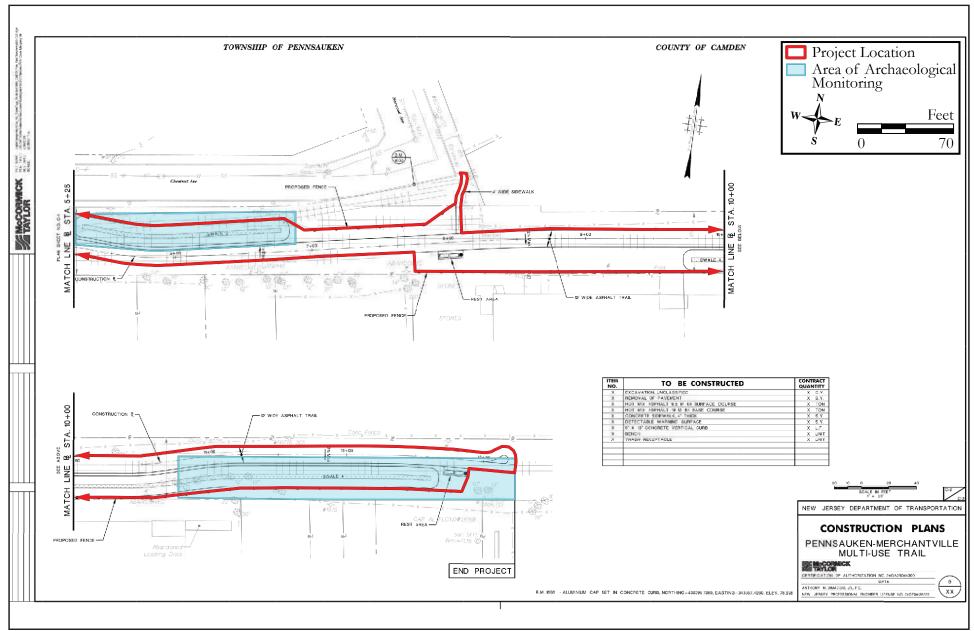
Construction plans, Sheet C-2 (from McCormick Taylor 2020).
